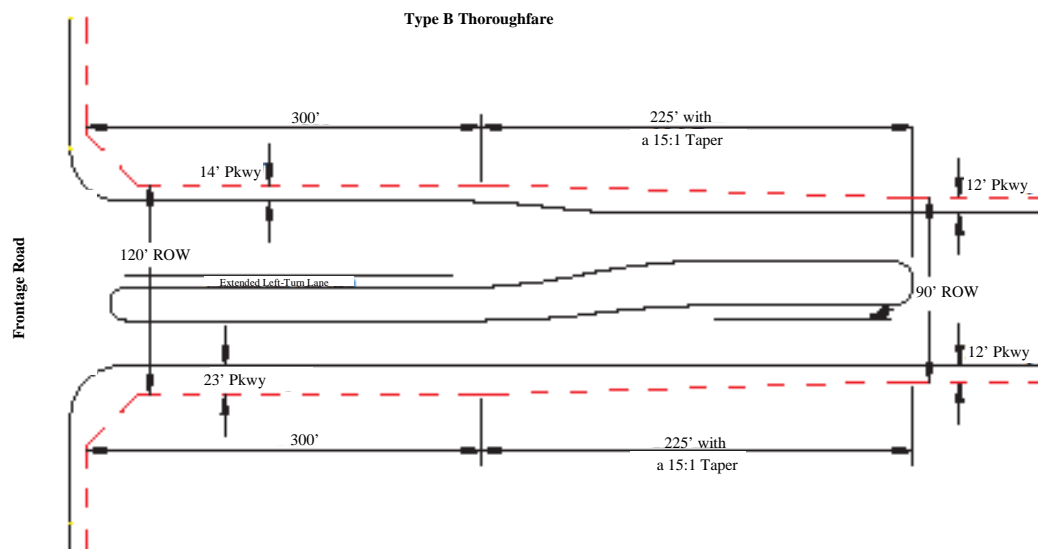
Type B Thoroughfare Intersection with Frontage Road
